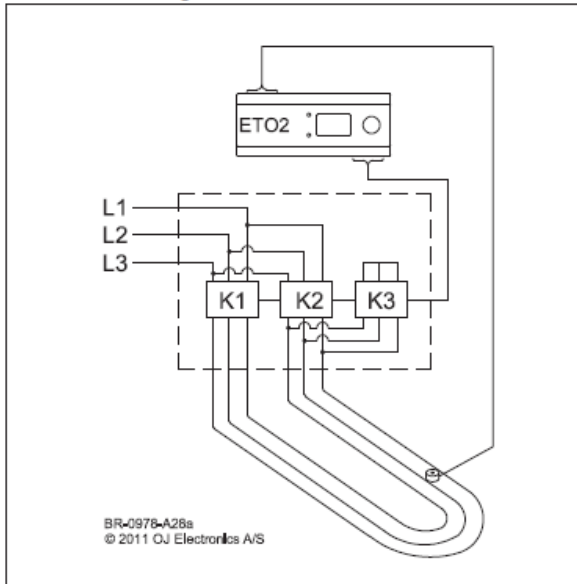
Advanced 2-step connections. 1/3 power on heating cables in afterrun.
